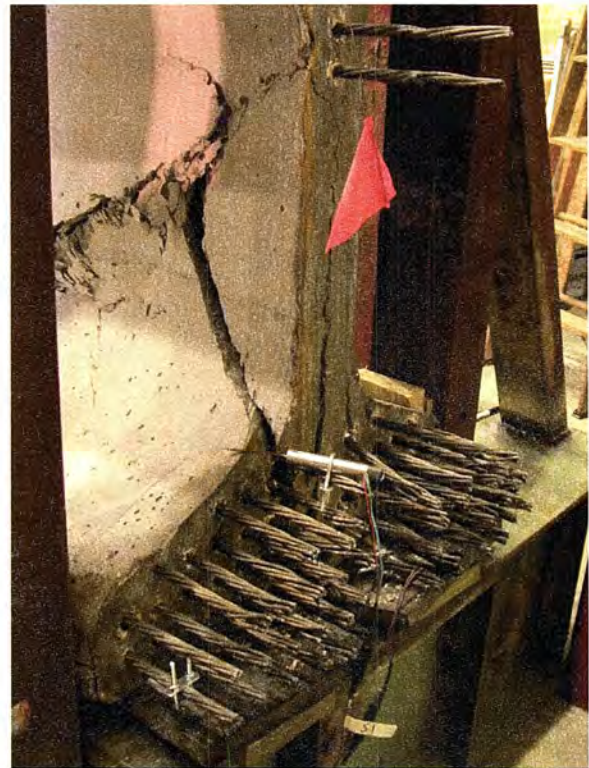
Vertical crack in web at west end of large-scale shear test beam after failure.
